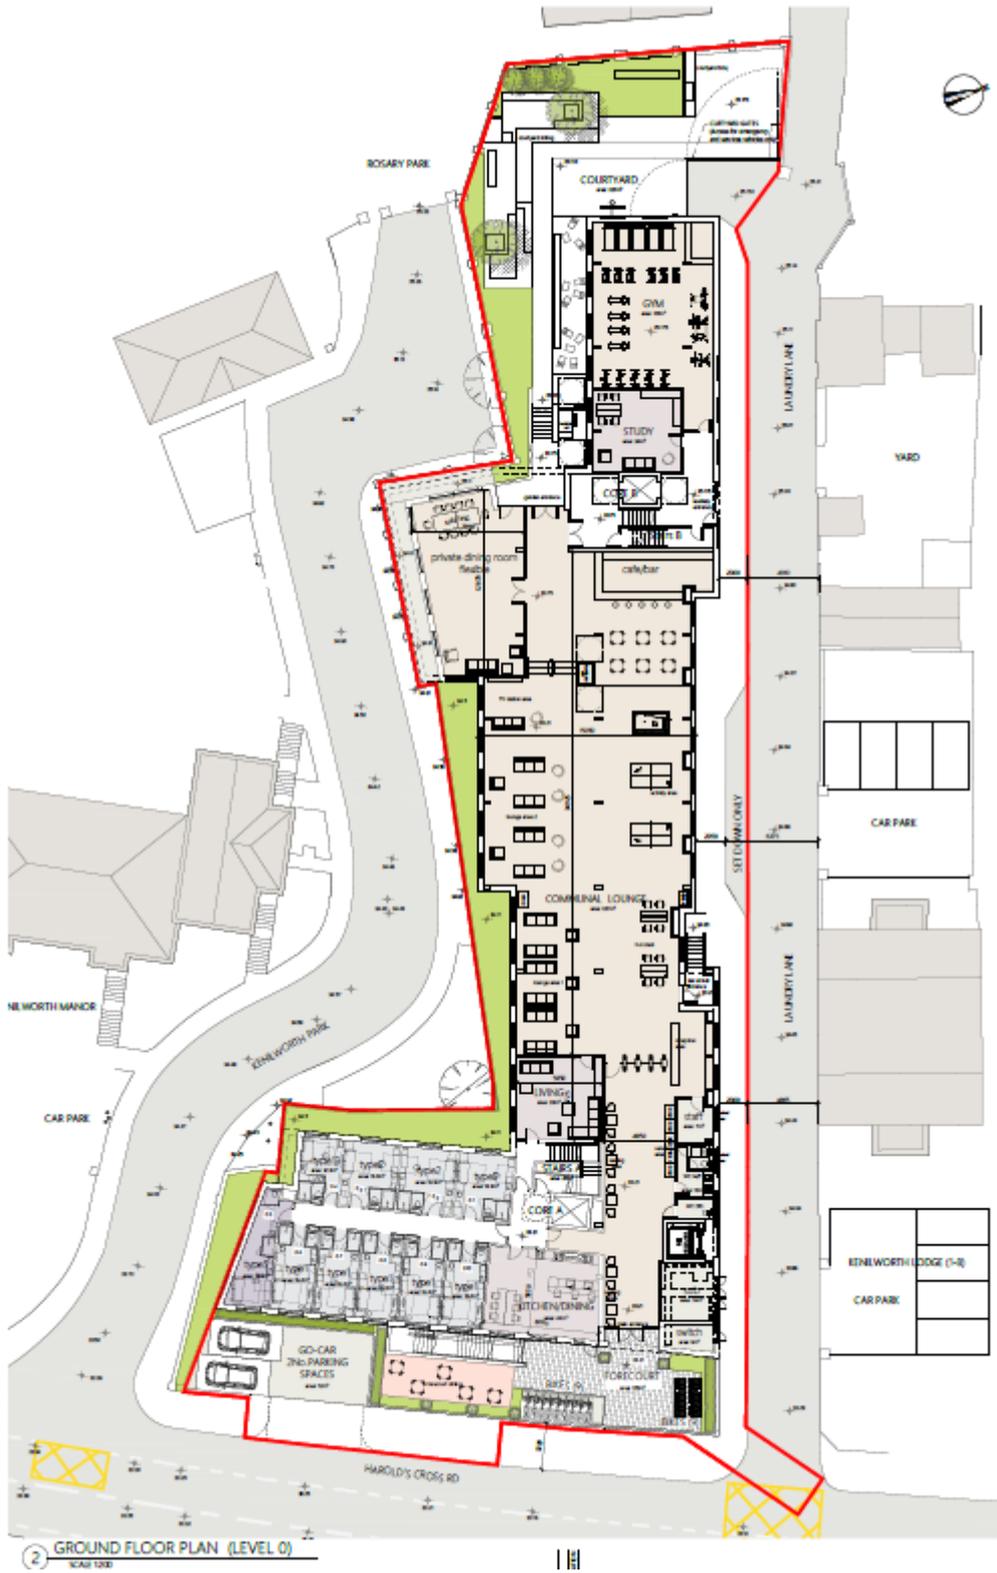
Architectural Ground Floor Plan Lvl. 0
